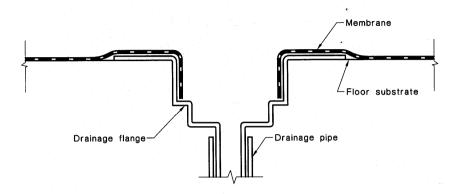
TYPICAL MEMBRANE TERMINATION AT DRAINAGE OUTLET
